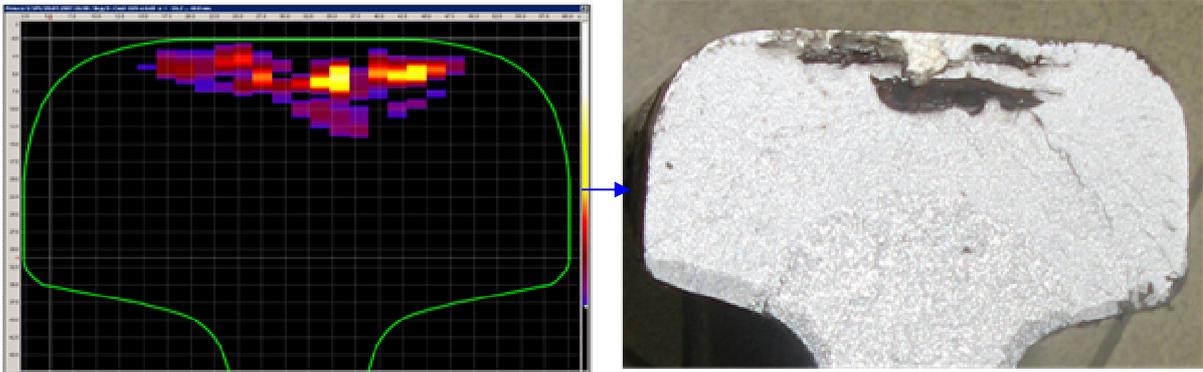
D-image (across the rail) of rail section with real flaws – horizontal exfoliations and progressive crack (left pane) and photo of fracture at the defected section (right pane)
